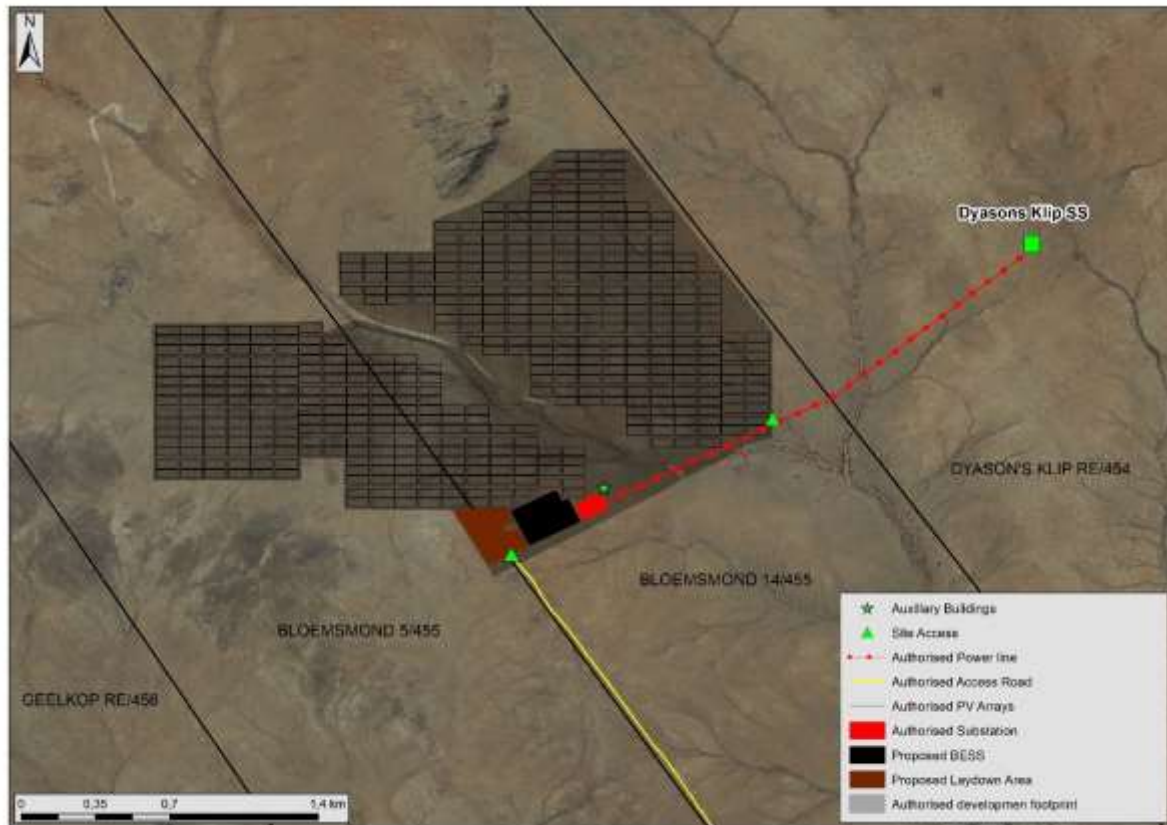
Excerpt of Site Layout plan, showing the proposed position of the BESS (black polygon) within the authorised footprint.
